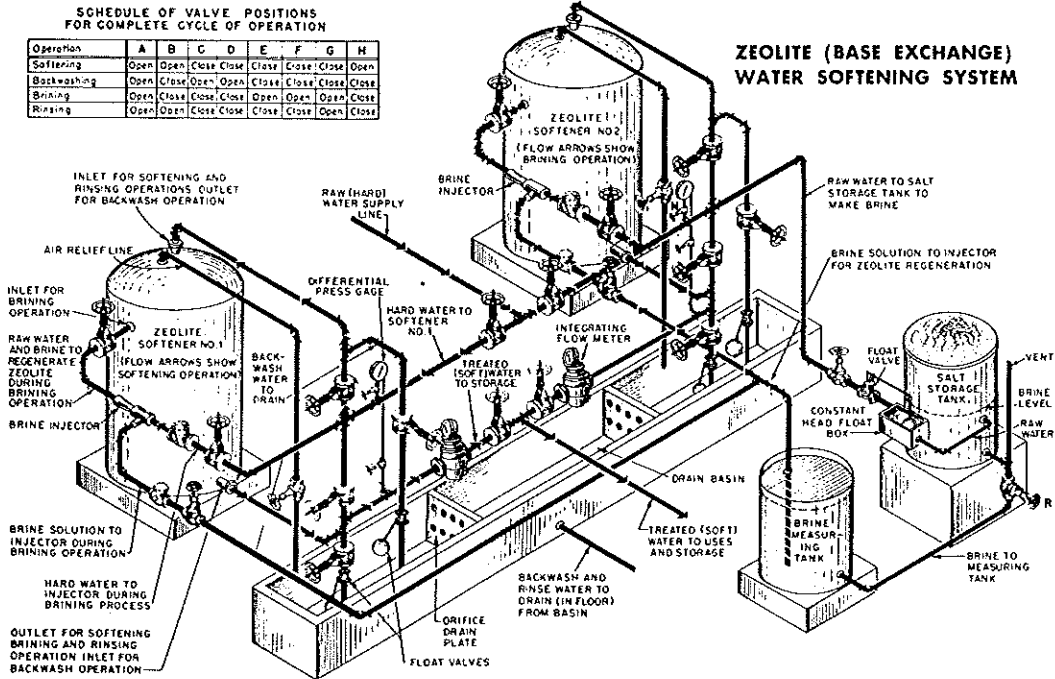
Typical water-softening system layouts. Courtesy Jenkins Bros., manufacturers of valves.
